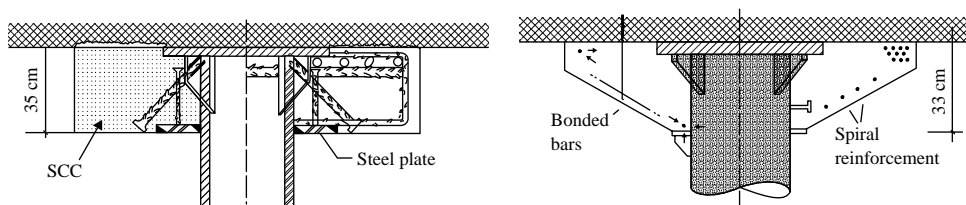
Sketches of concrete collars with self-compacting concrete and shotcrete
